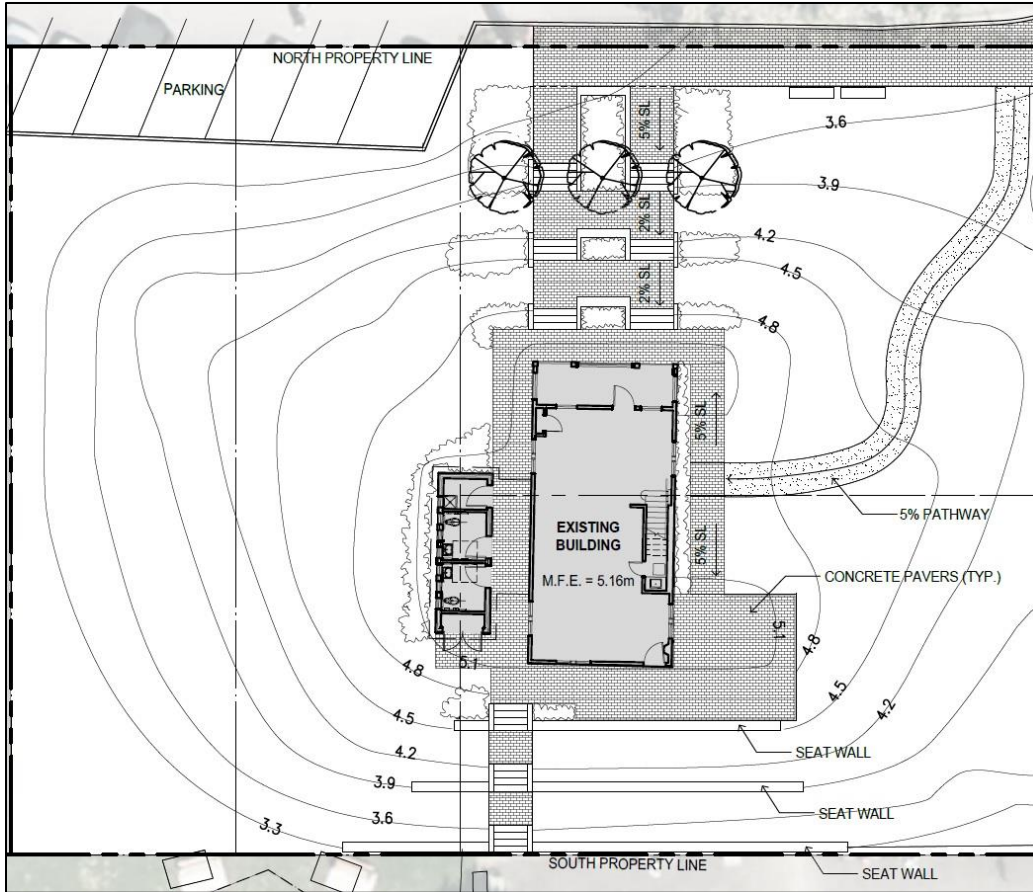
The proposed site plan, illustrating the new access points to the raised building. (Source: DA Architects + Planners)
